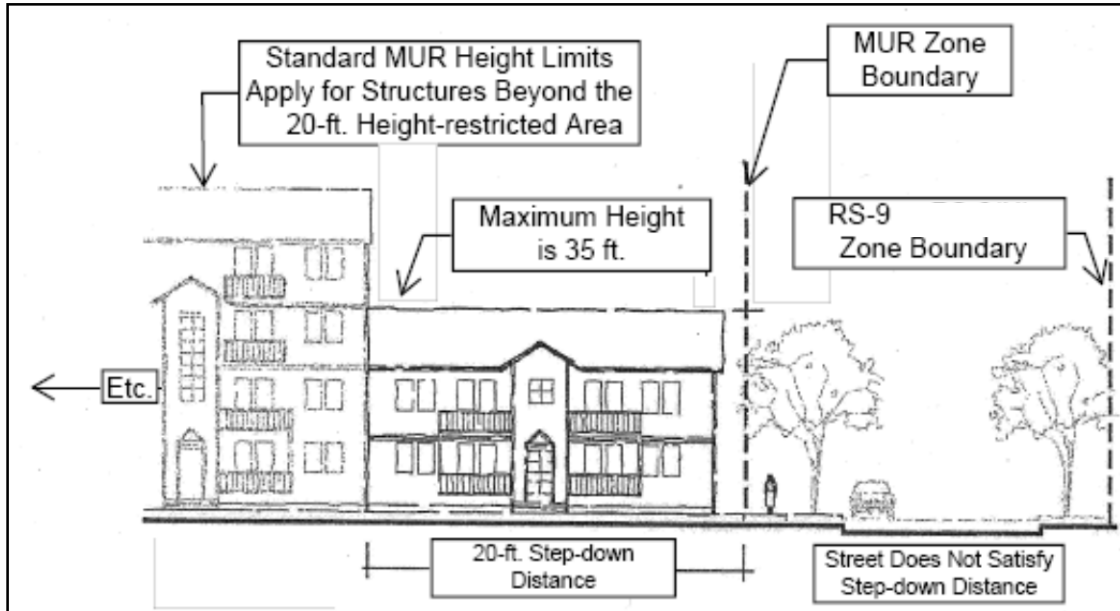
Required Height Transition Area When a Development is Zoned MUR and is Next to Land Zoned RS-9
